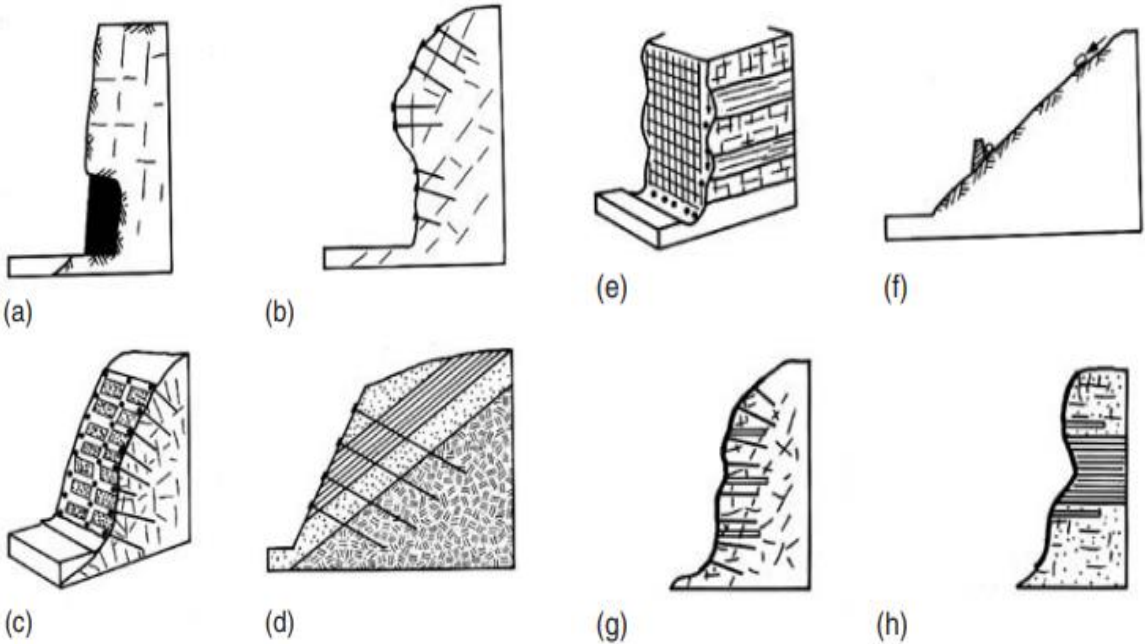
Suggested methods for stabilization and protection of rock slopes.; (a) concrete buttress for stabilizing overhang; (b) rock bolts used in jointed rock mass; (c) concrete straps and bolts for heavily jointed rock mass; (d) cabled anchors to reach stable rock; (e) wire mesh to prevent rock falls; (f) Impact walls to stop rolling blocks; (g) Drainage combined with bolting; and (h) shotcrete to retard slaking and weathering (Hunt, 2005).
